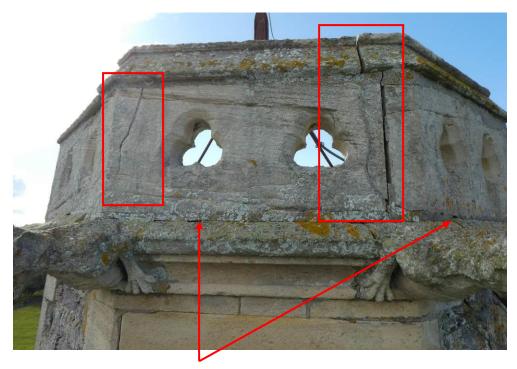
P1000401 Masonry Fracture & Open Joints in Stair Turret Parapet Panel North Elevation
